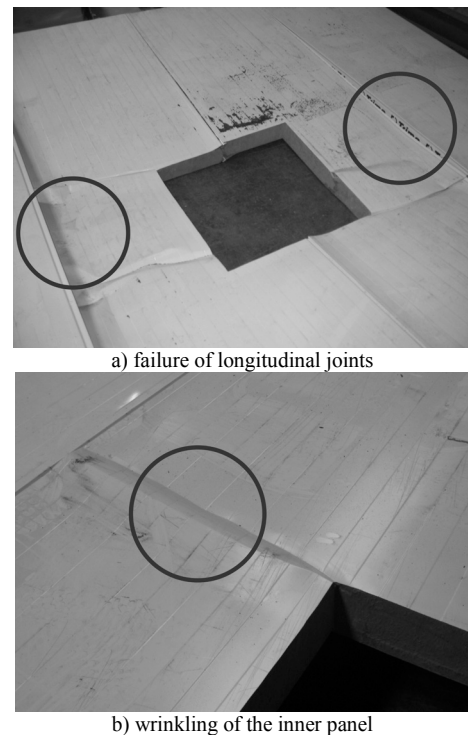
Collapse of interconnection system of four sandwich panels with large window opening positioned centrally across two inner panels
